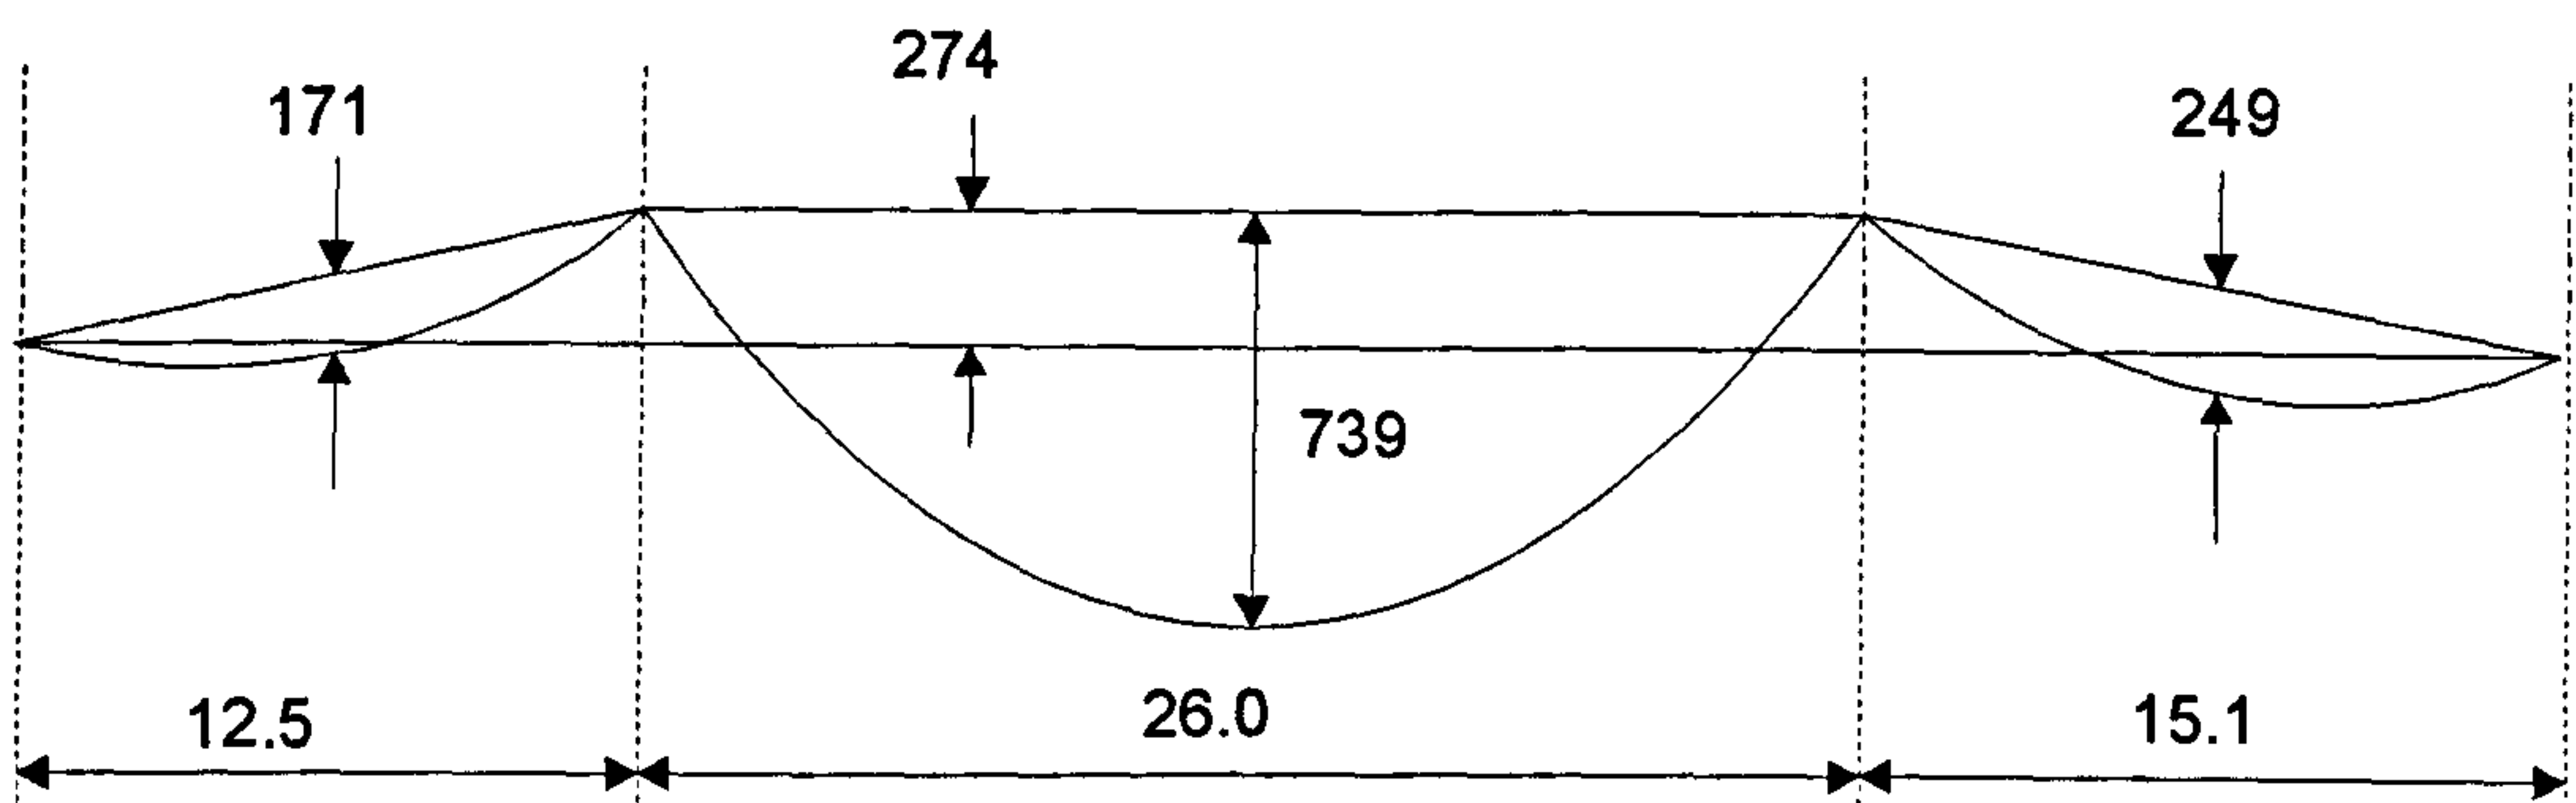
Layout of Tendon Profile for Three Span Example
